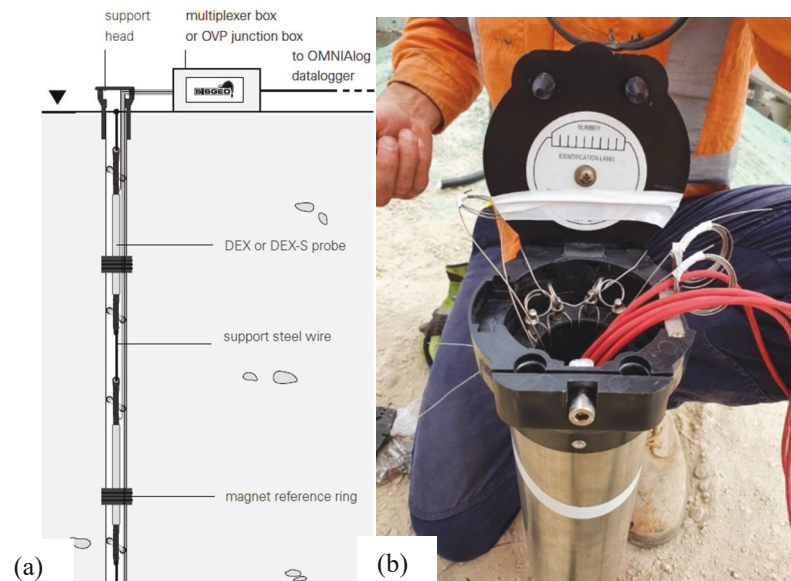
Extensometer, (a) field setup and (b) support head with steel cables and electrical cables
